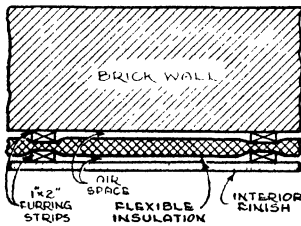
Alternate Method of Applying Flexible Insulation to Masonry Walls Using Second Layer of Furring Strips over Insulation to Provide Air Space between Insulation and Interior Finish
